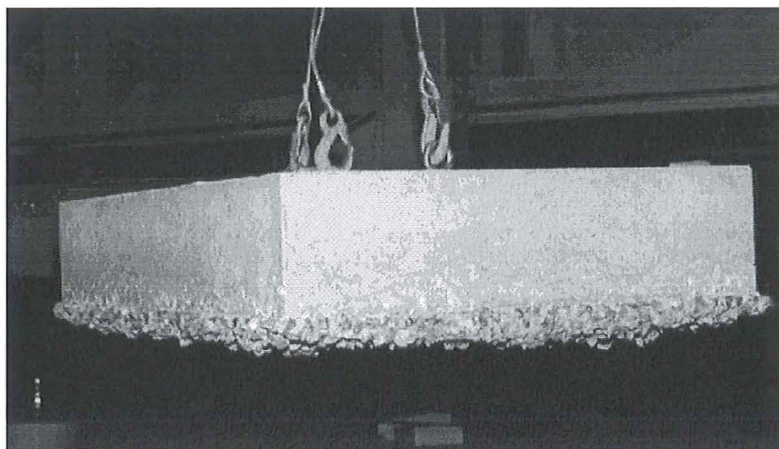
Bottom surface of the slab after performed test on crushed aggregate.
